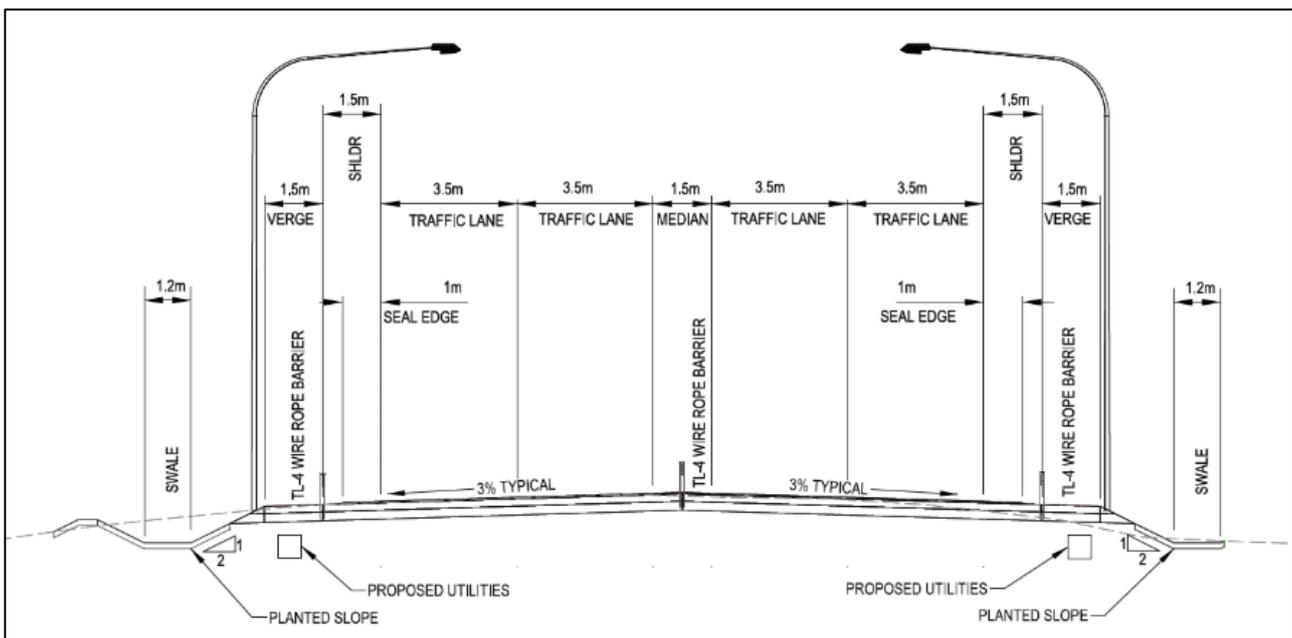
Typical cross-section of the proposed SH1 main alignment
